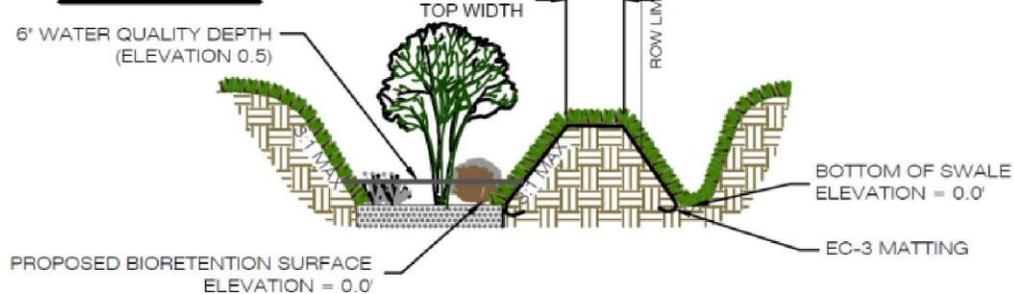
Typical Details for Off-Line Bioretention (source: VADCR, 2010)
